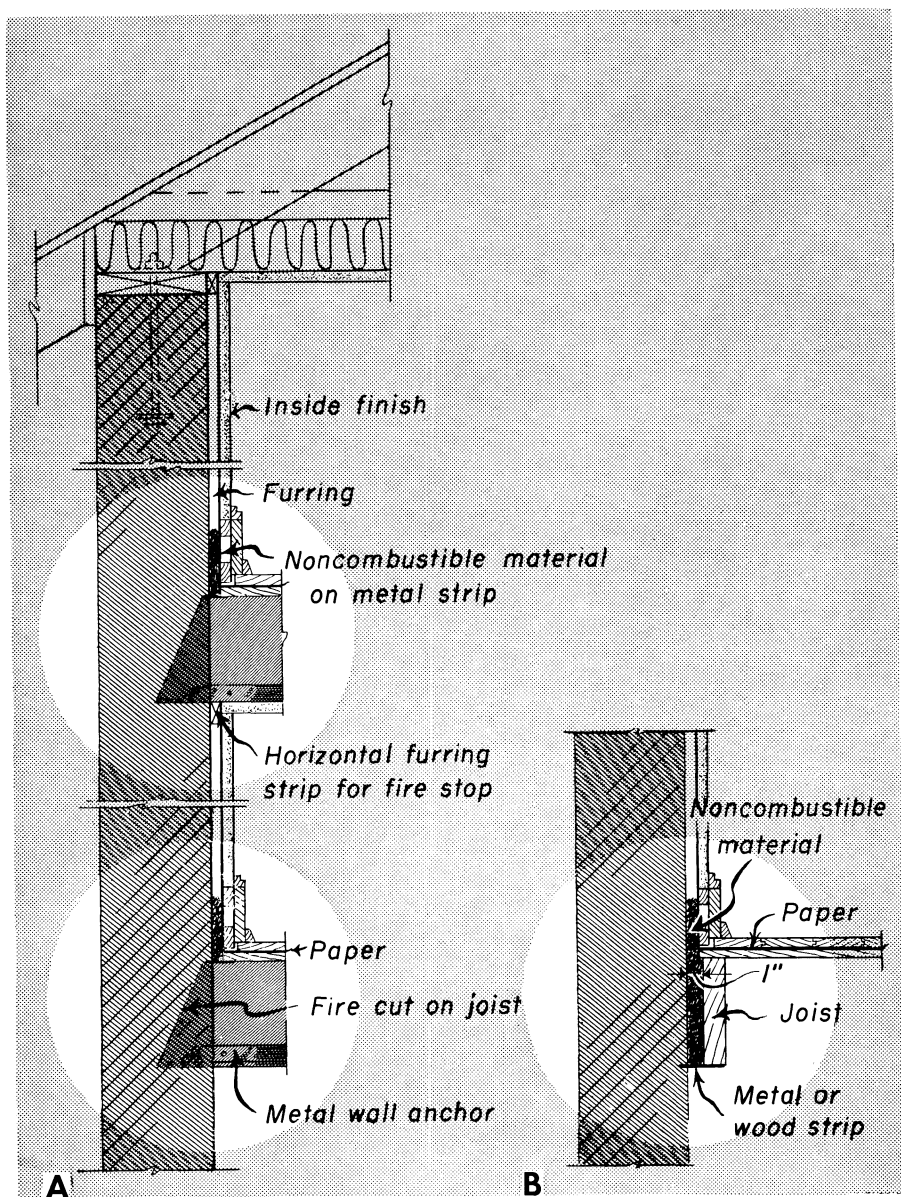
If a building has masonry walls the spread of fire in the flooring and wall finishing can be retarded: A, By providing fire-stopping between the masonry and the inside wall, or B, by setting the joists which run parallel to masonry walls 1 inch from the wall and packing the space between with noncombustible material.
